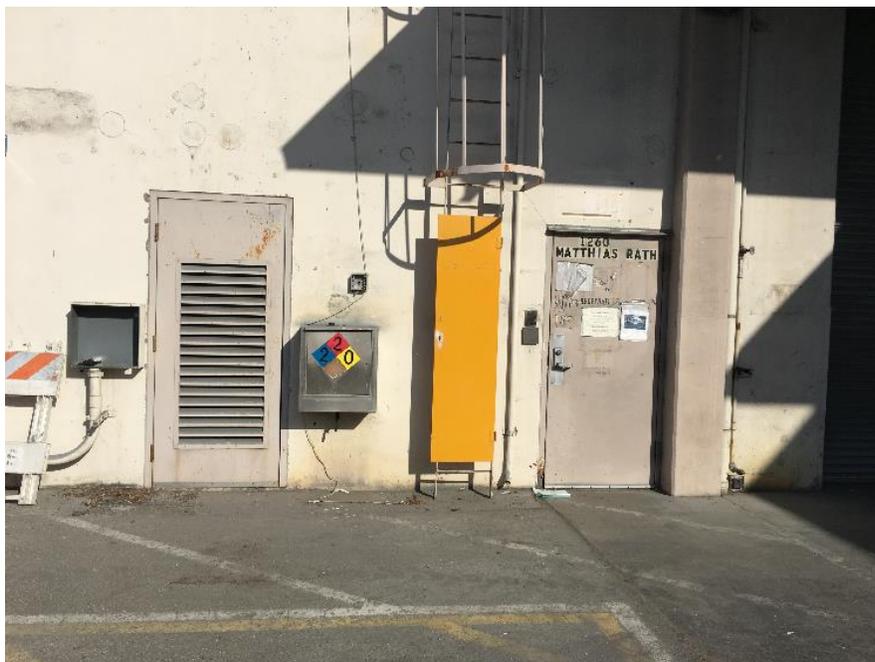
Entrances in the southern façade of the original 1961 building, view north (ARG, November 2019).
